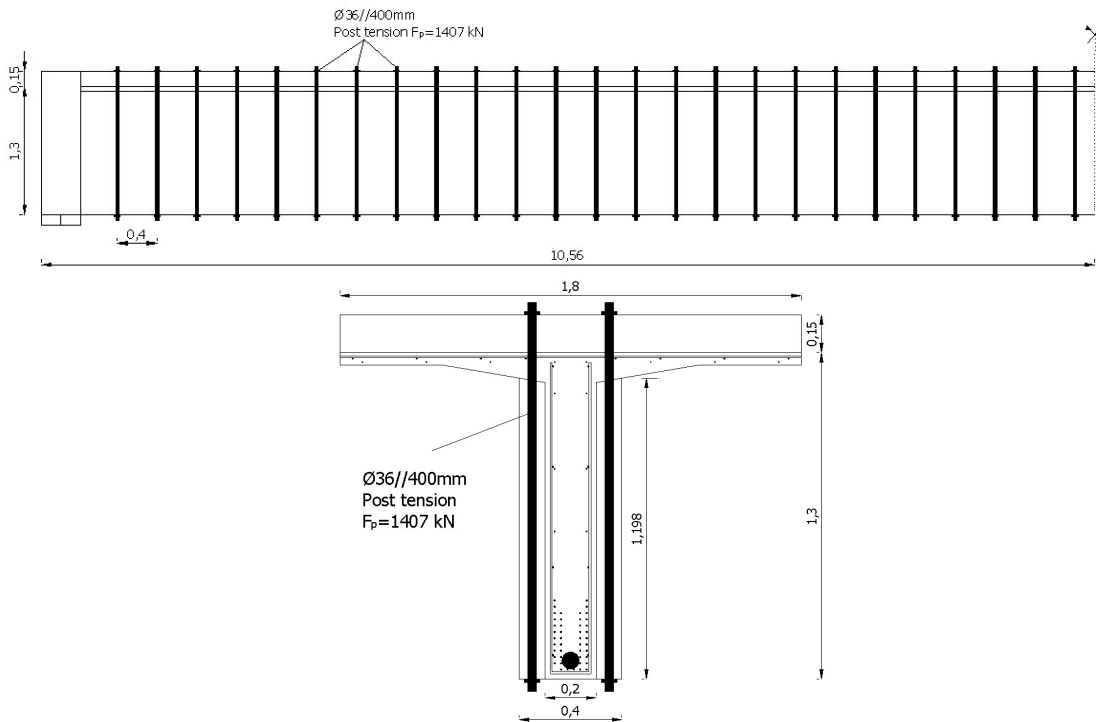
Shear strengthening proposal for the Wassnerwald bridge
